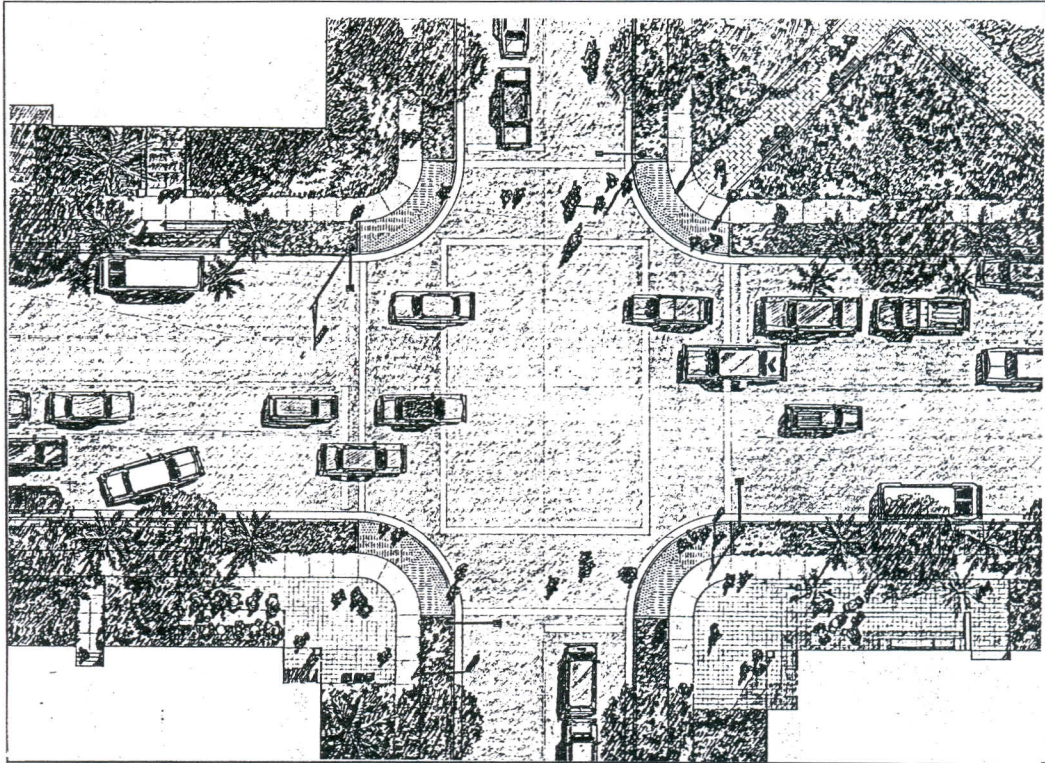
Street design standards for sidewalks, roadways, curbs, lighting and planting are shown in this typically intersection plan of Playa Vista (Source: Katz 1994).
